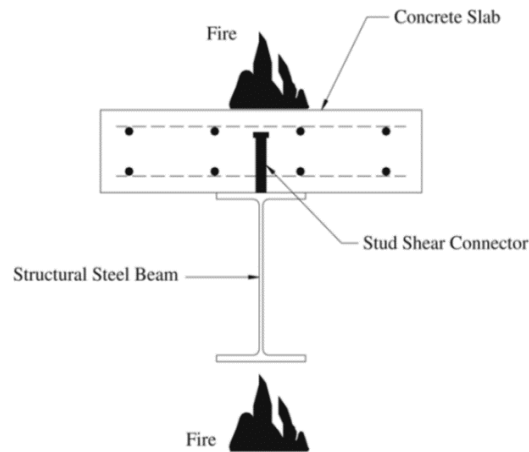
Cross-sectional diagram of composite steel and concrete beam subjected to fire (Mirza and Uy 2009)
